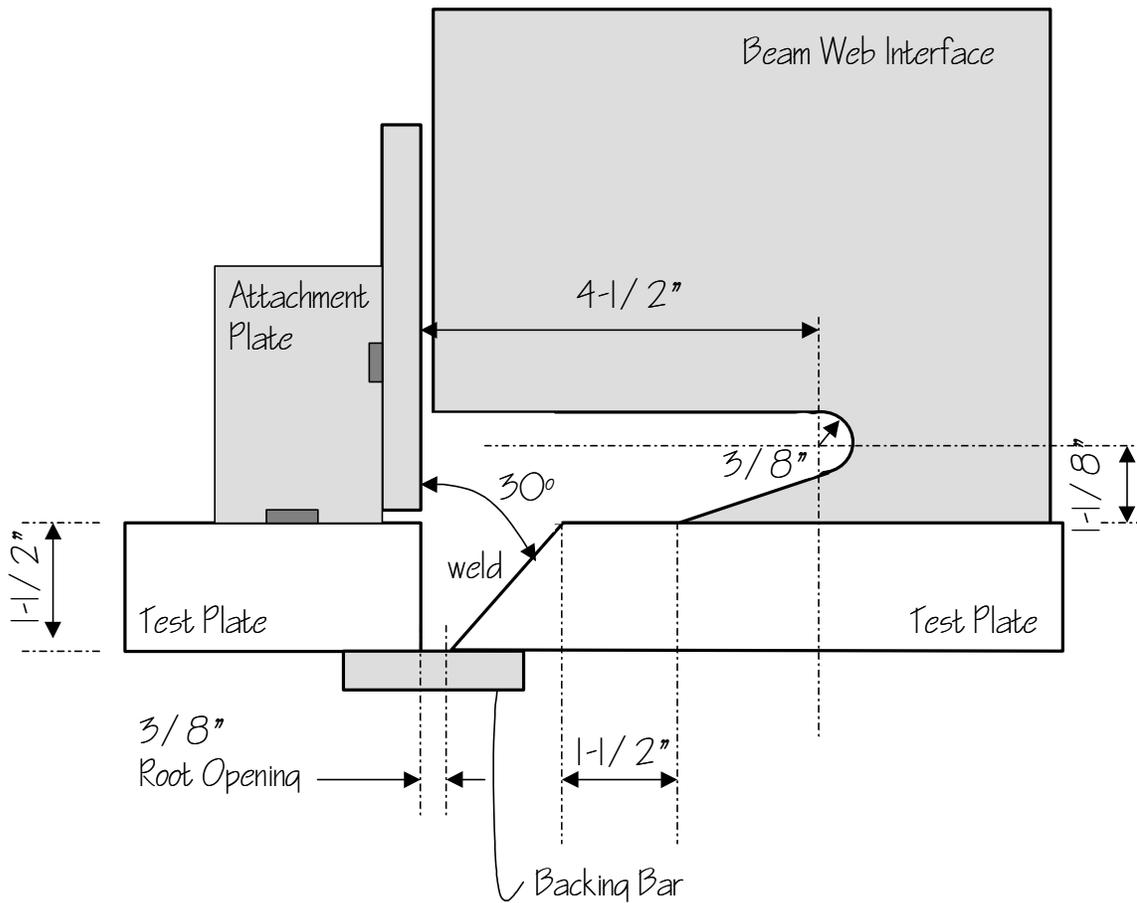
Supplemental Welder Qualification Test Assembly
